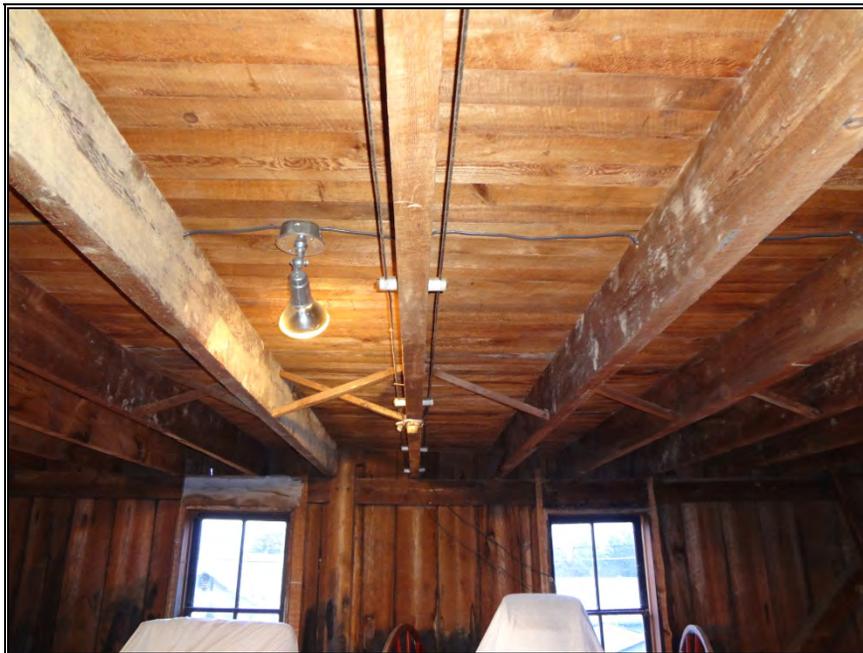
interior view, first floor, of existing light fixtures and wiring to be removed
